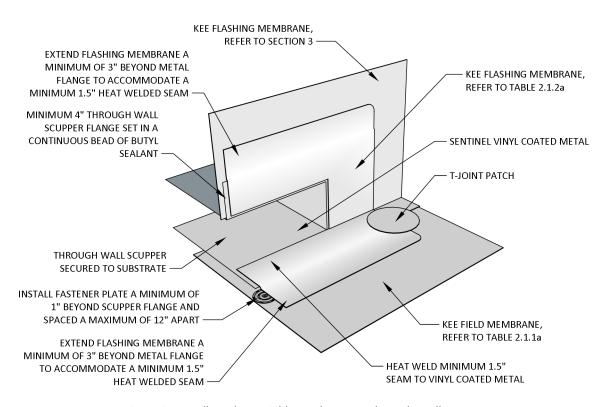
Adhered KEE Field Membrane at Through Wall Scupper
